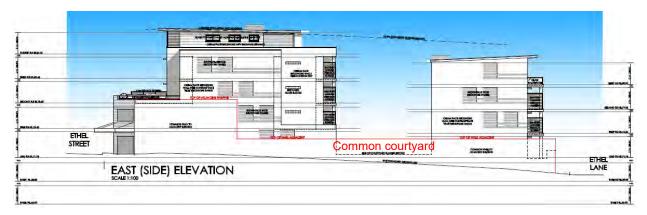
Extract from the East (Side) Elevation Plan showing that the proposed 5 storey development comprises 2 building forms which are separated by a central courtyard.
